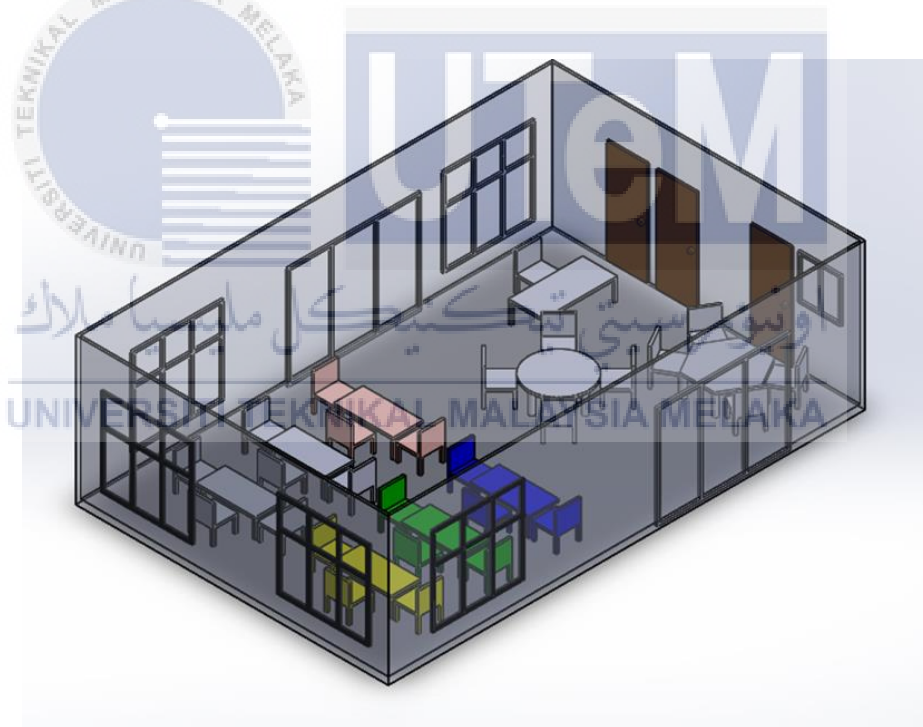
Layout building for Tabika Kemas Rumah Pangsa Kampung Padang, Malacca.
